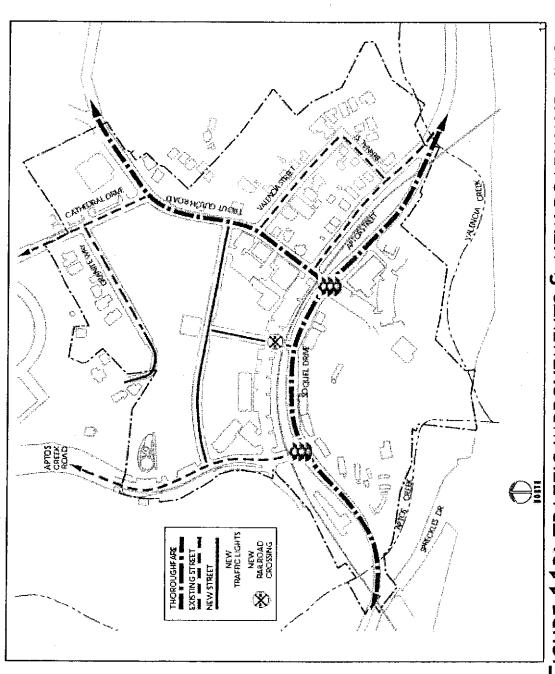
B: TRAFFIC IMPROVEMENTS & NEW ROADWAYS, INCLUDING INTERSECTIONS, SIGNALS, & RR XING IMPROVEMENTS
